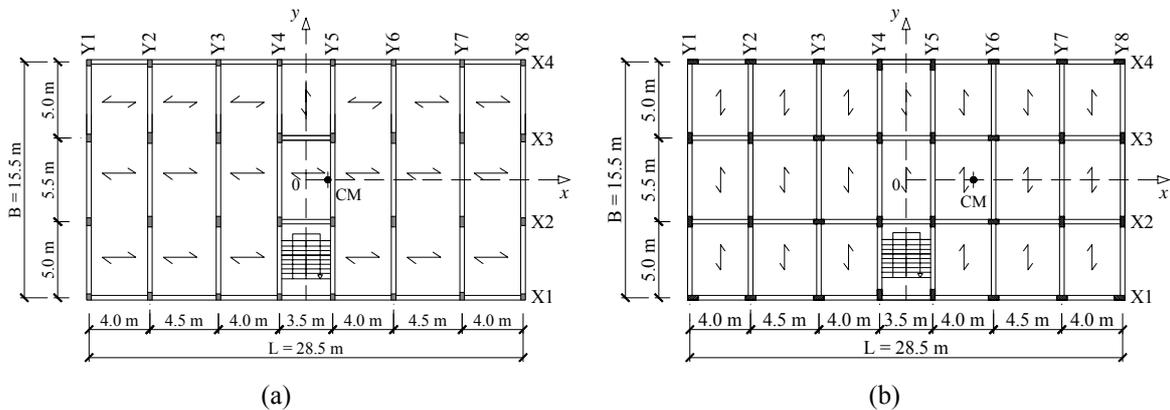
Plan layout of the analysed buildings: (a) GL structures; (b) SR structures
